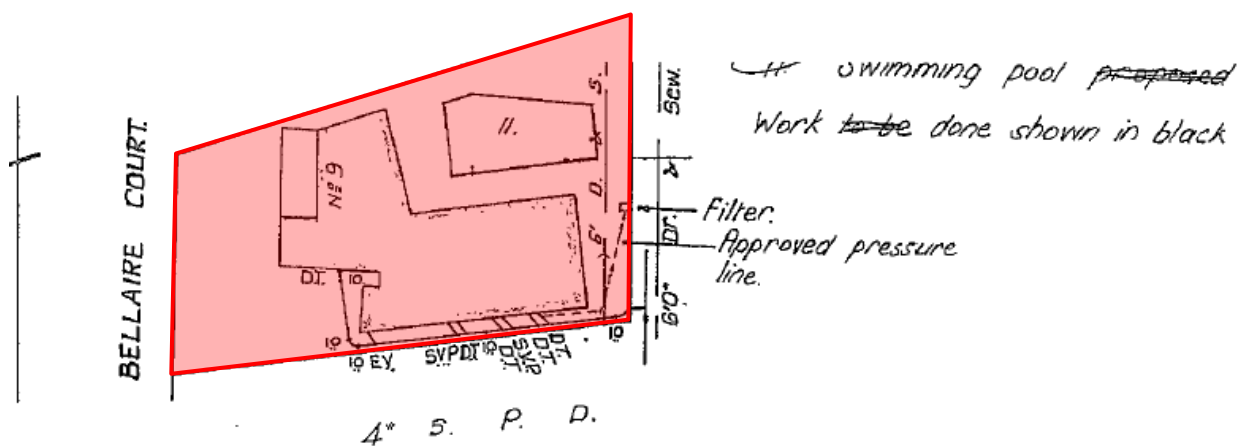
1971 property sewerage plan associated with swimming pool addition.
